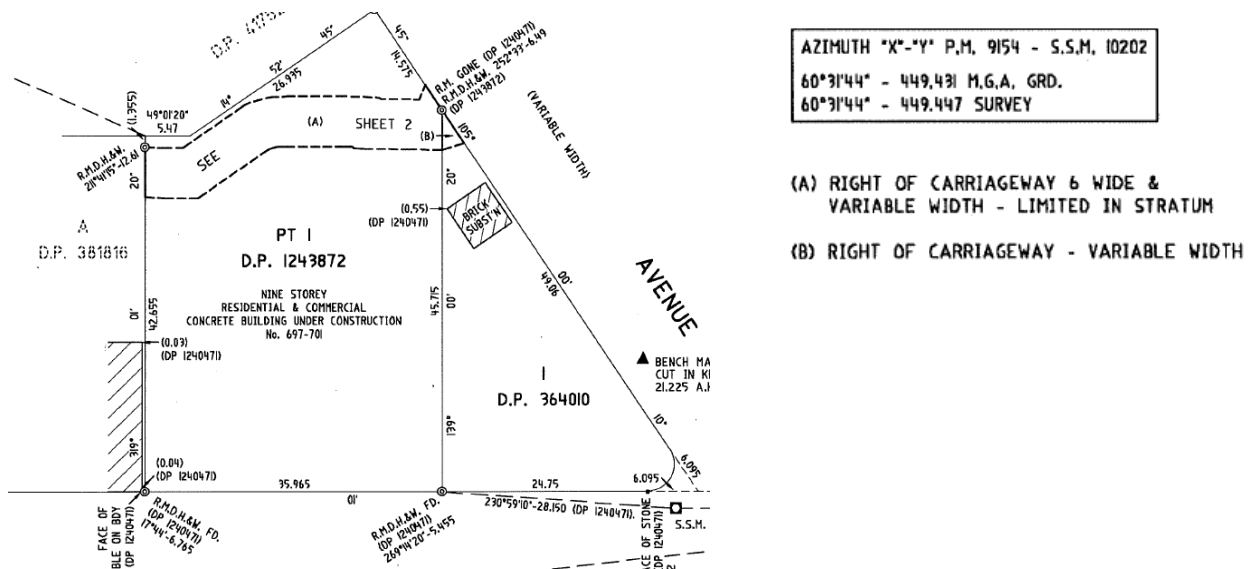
except from the survey plan relating to the plan of easement for the right of carriageway with Lot 1 in DP 1243872 and Lot 1 in DP 364010 at 701 Pittwater Road
